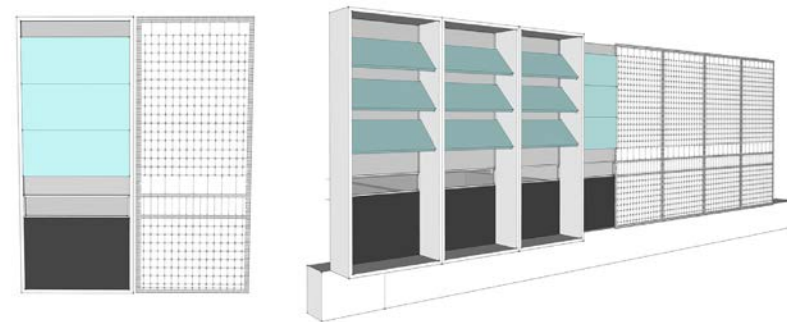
Isometric: Window proportions translated into cliff wall design development (Author 2016)
